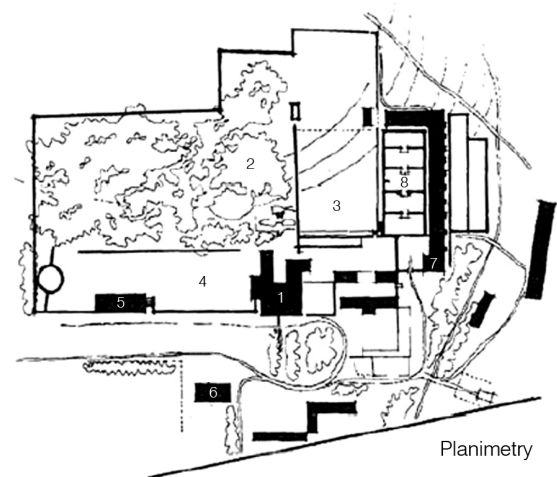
Rural architectural of coffee plantation, Laborie, 1798 [13]
